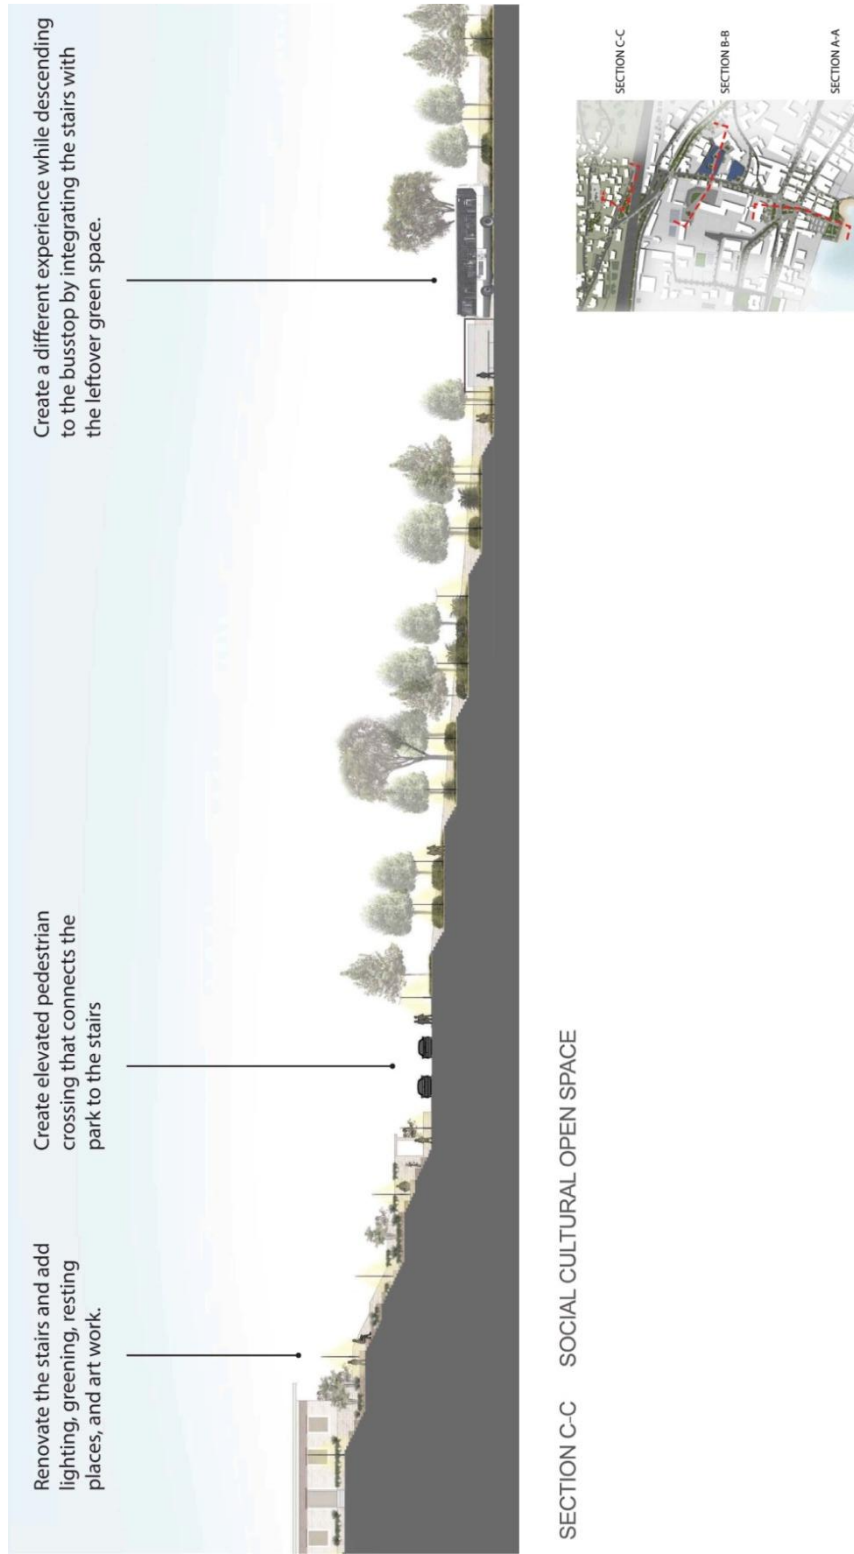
Detailed section C-C for the design proposal cutting through the mountainous zone(Koobayssi, R., 2018)
